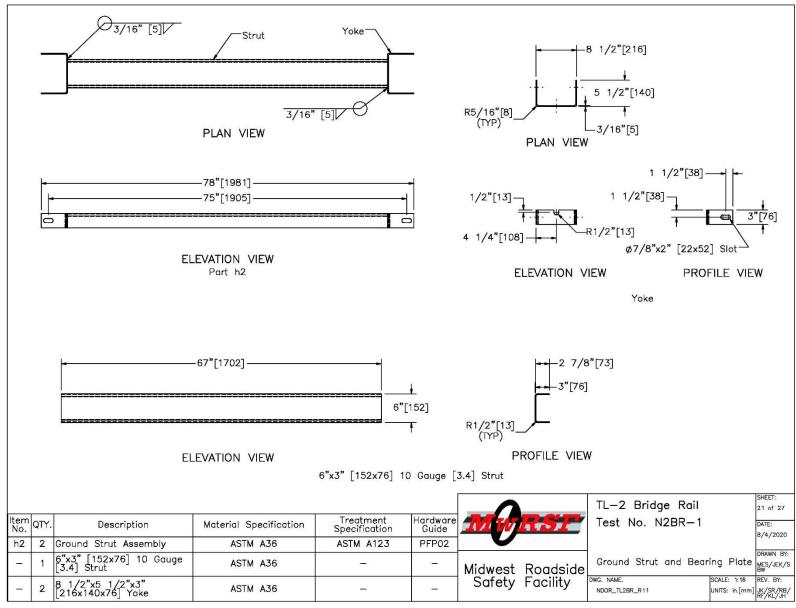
Ground Strut and Bearing Plate, Test No. N2BR-1
